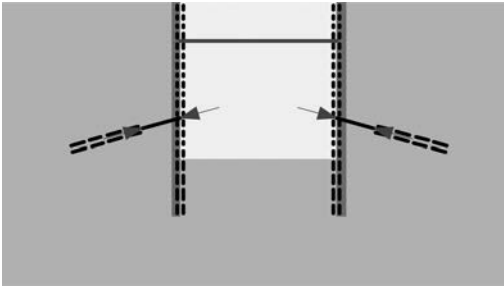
Example of an excavation with the diaphragm wall, strut and anchors.
